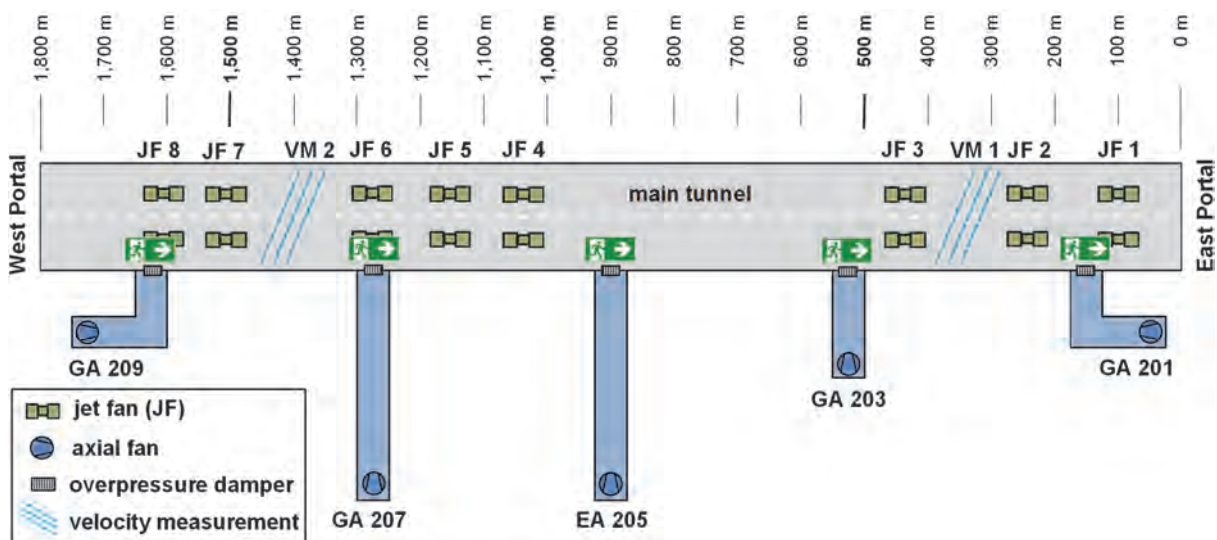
Schematic layout of the escape way ventilation and the tunnel ventilation system
